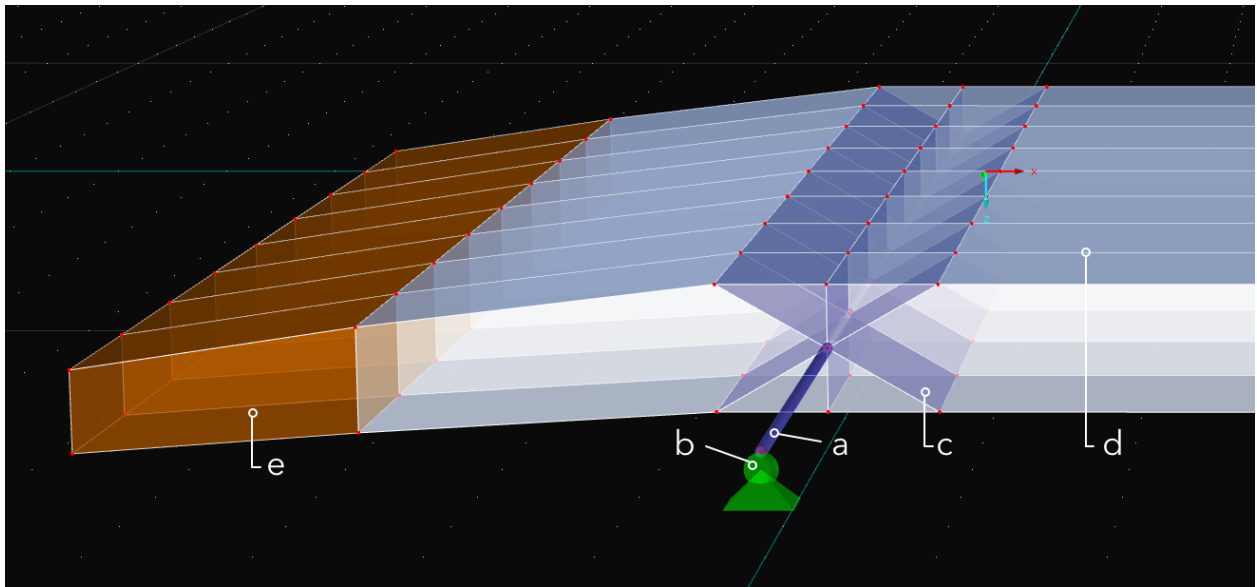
Impression of trunnion implementation in composite structure: (a) steel trunnion, (b) trunnion bearing, (c) transverse stiffeners, (d) longitudinal stiffeners and (e) counterweight
